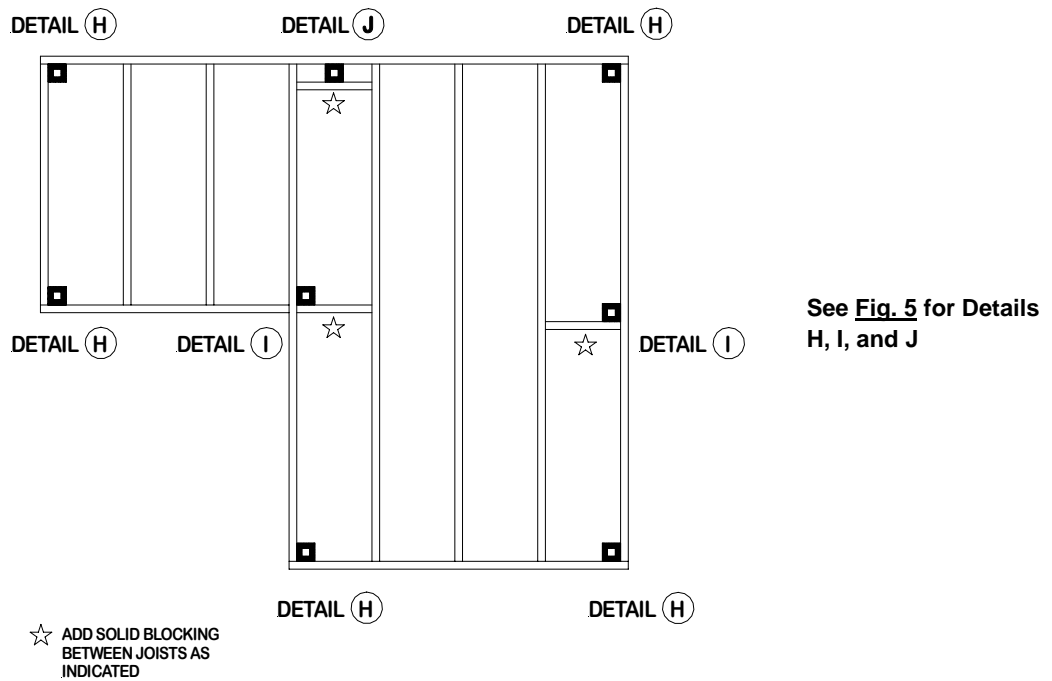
PLAN VIEW OF TYPICAL POST LOCATIONS FOR SET IN POST INSTALLATION
